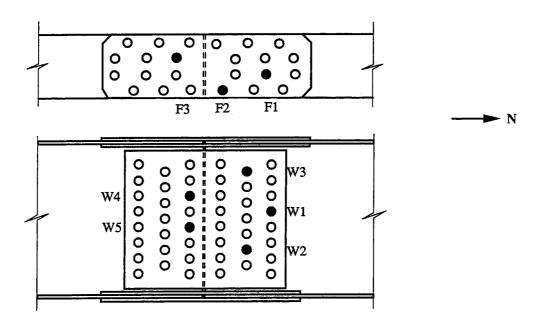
(b) Location of sampled bolts in connection N3 of bridge B2
